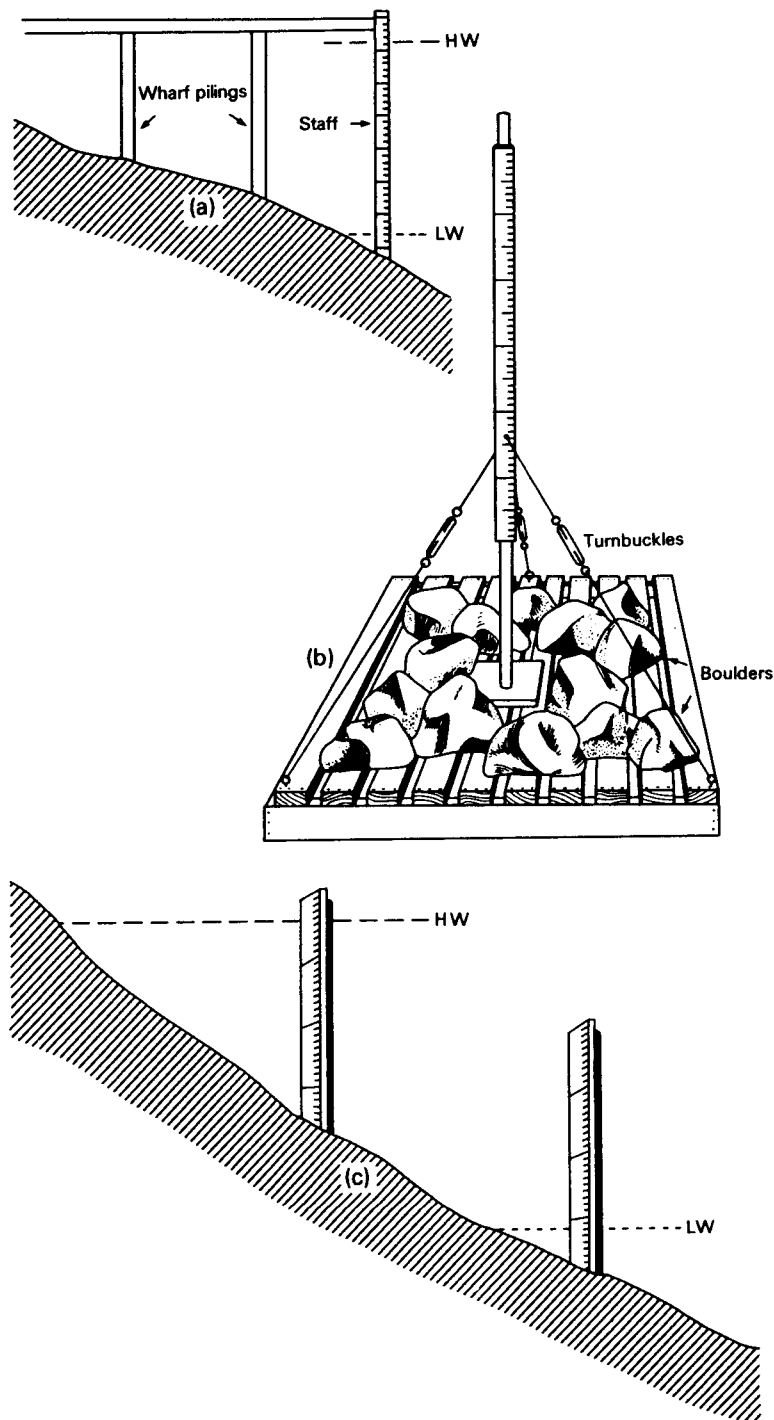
Staff gauge installations (a) on wharf piling, (b) on submerged platform and (c) on long sloping beach.
